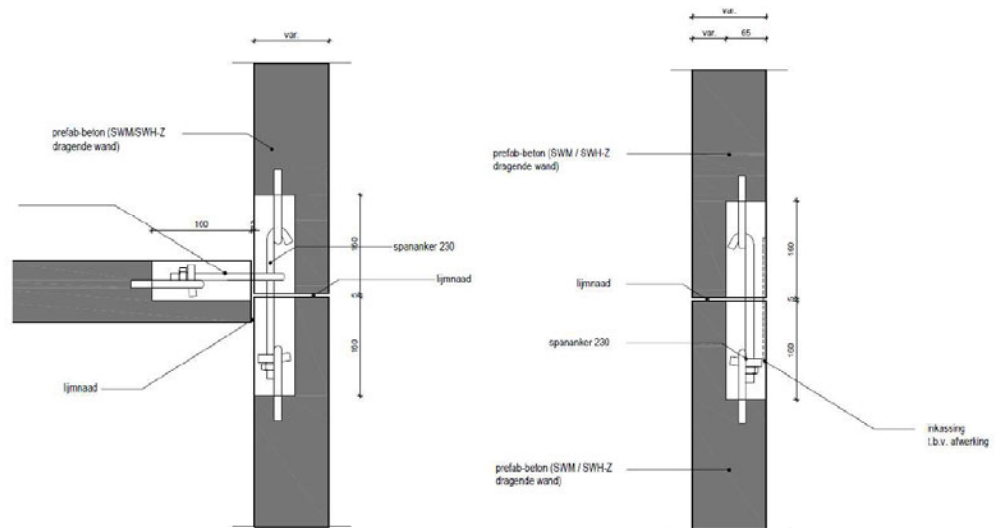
Three-way and two-way anchorages for wall-to-wall connection; adapted from [Brunesi et al, 2017a].
